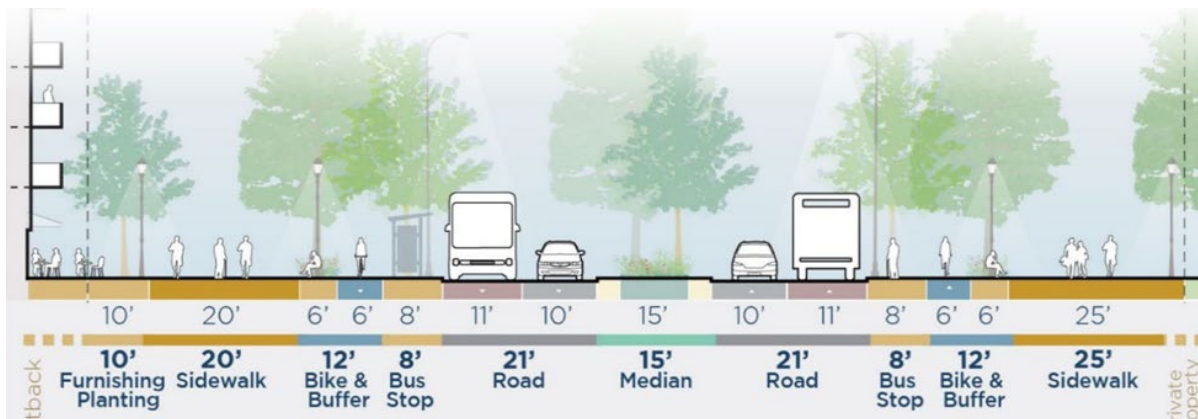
Proposed Cross-Section on 9<sup>th</sup> Street
